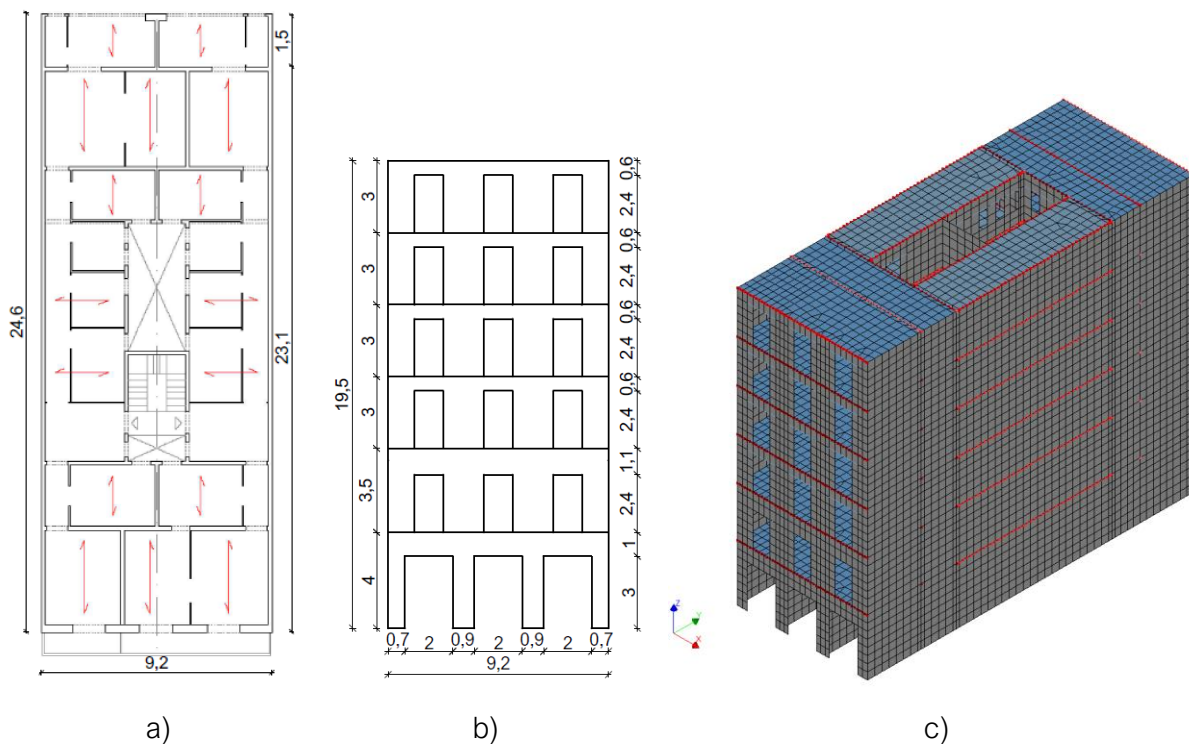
Geometrical configuration of a representative narrow building model with central core without lateral patios (in metres): a) Floor plan section; b) Front façade geometry; c) 3D finite element model.
